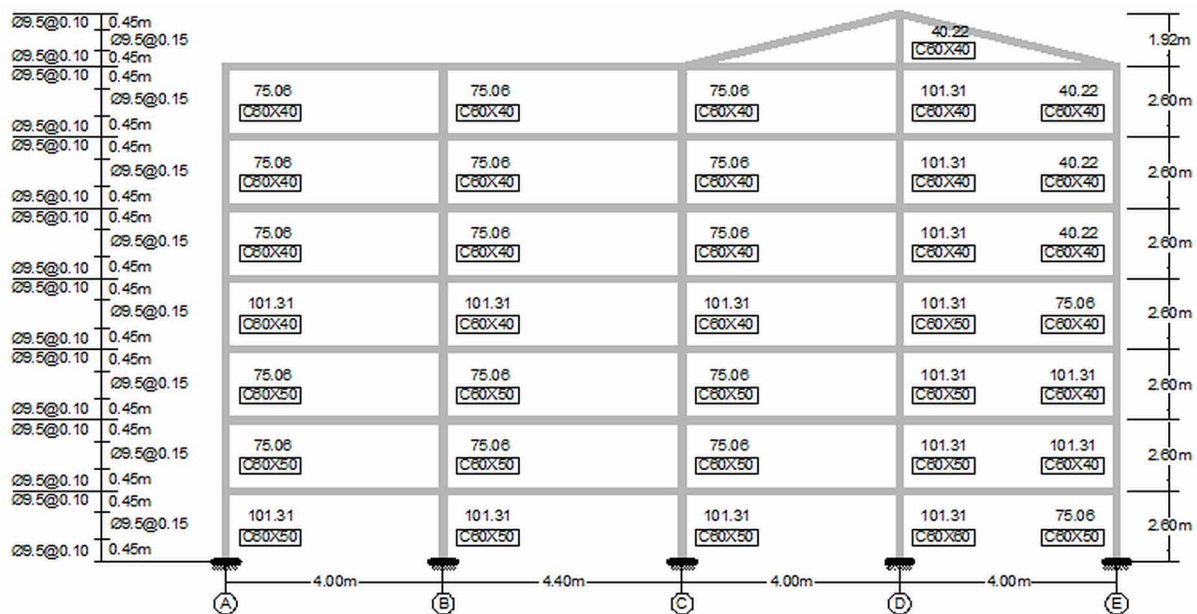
Residential building, geometry and reinforcement in columns of the frame 3
